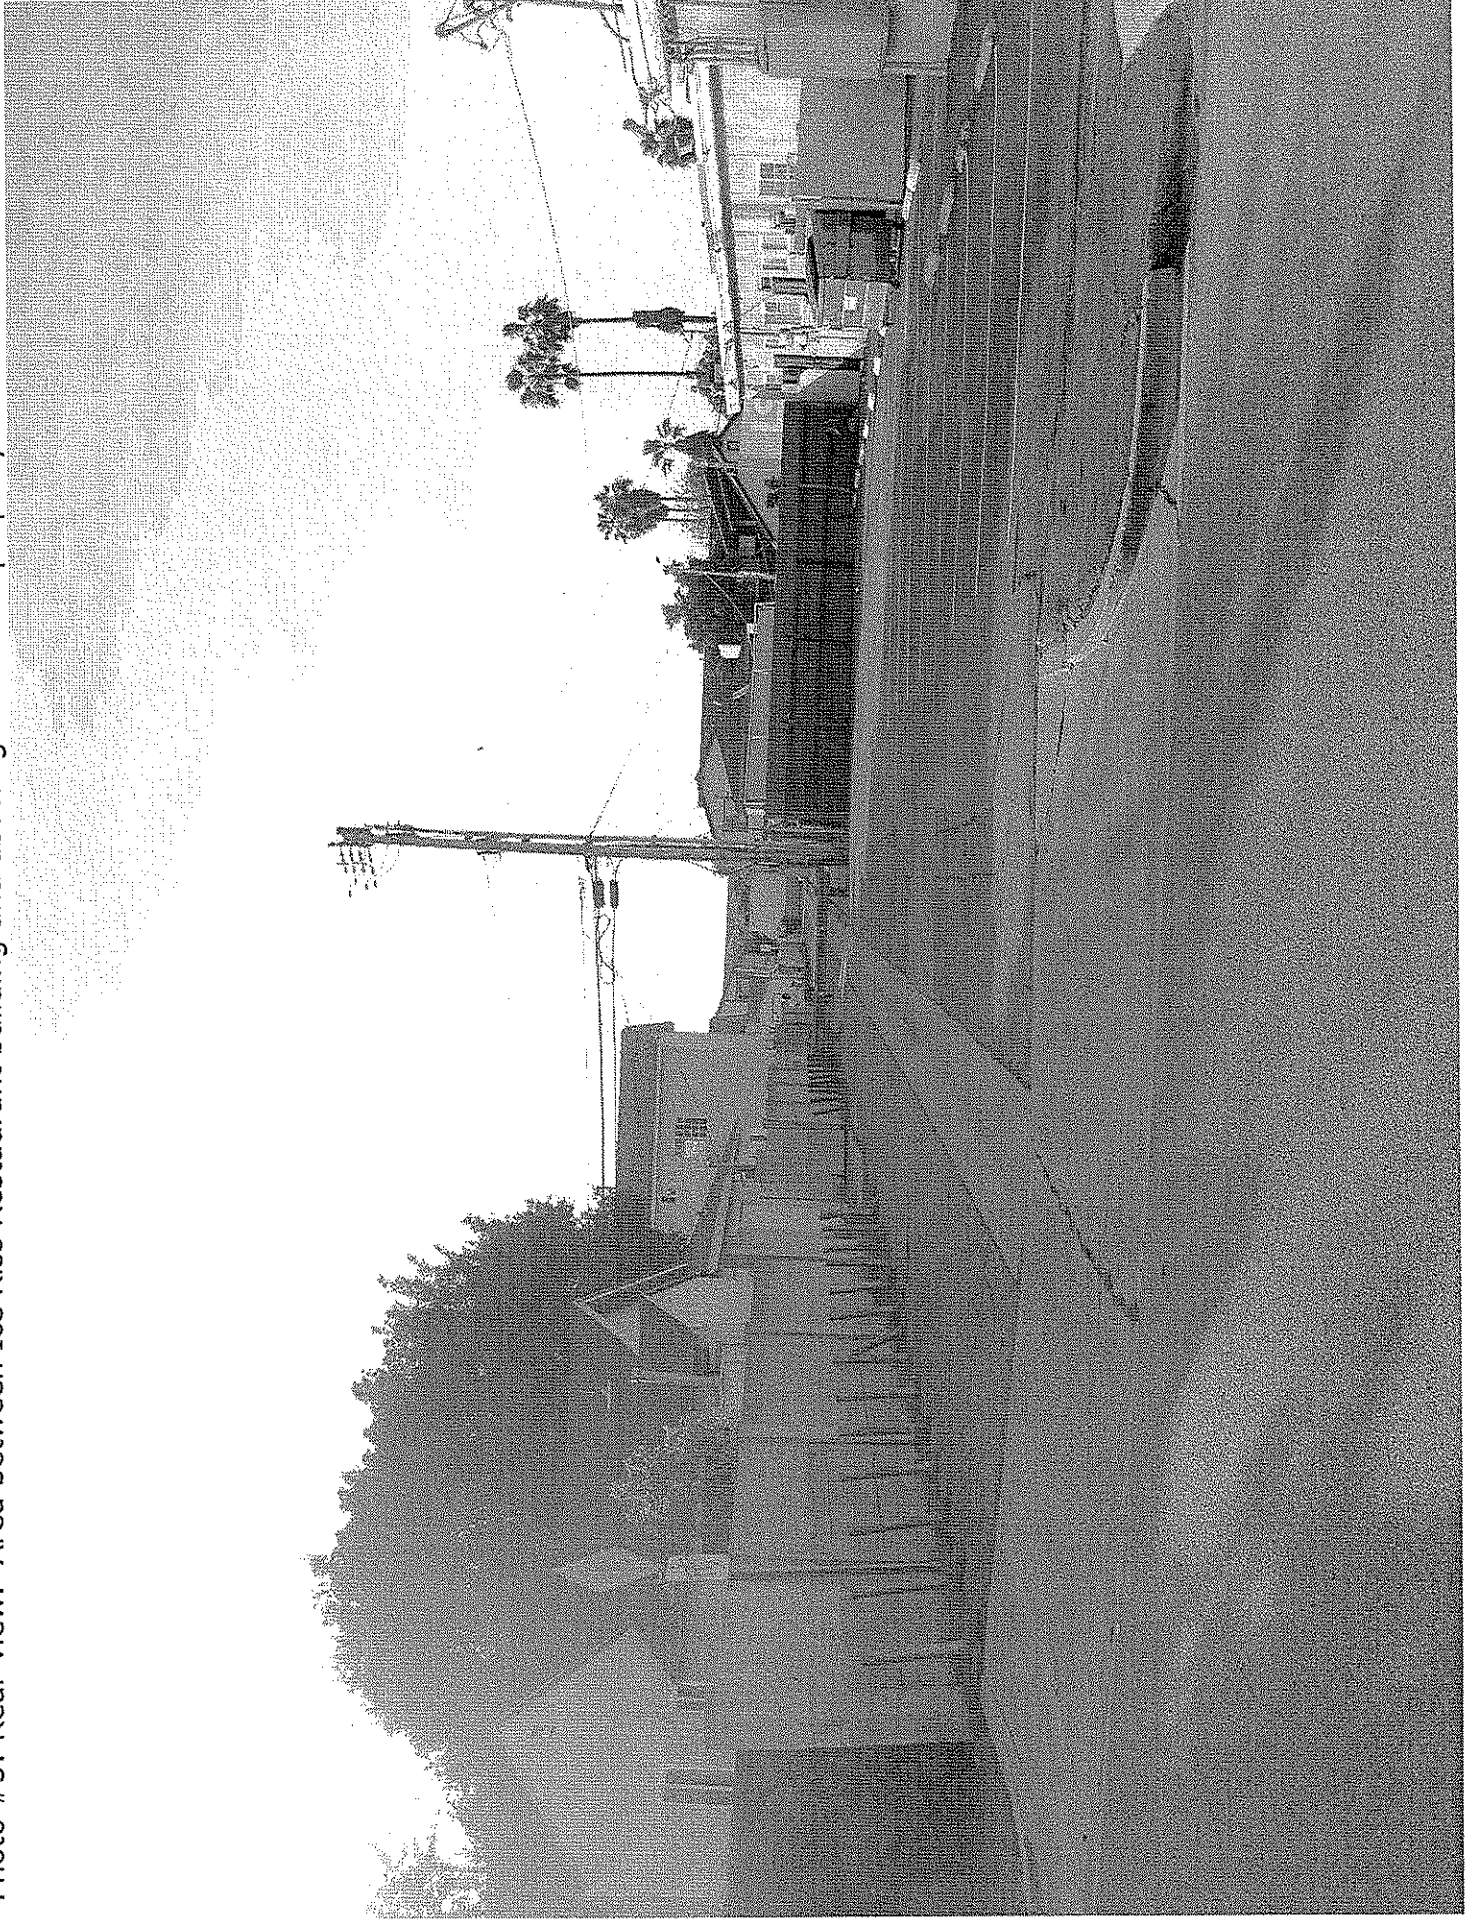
Rear view. Area between Ice Kiss Restaurant building and abutting residential property.
